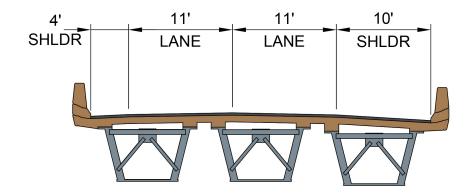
New Exit 29 Bridge over Route 5/15 Southbound with a 4-foot Left Shoulder, 11-foot Lanes and a 10-foot Right Shoulder.
